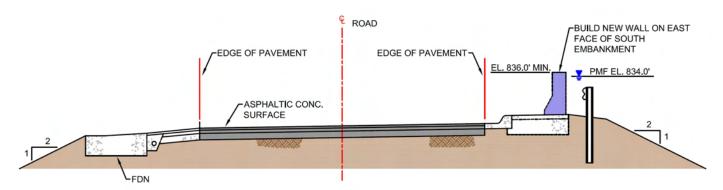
Fort Loudoun Dam – Concrete Floodwall Concept for Segment FTL-3 (U.S. Highway 321 Bridge to Tellico Recreation Area)
